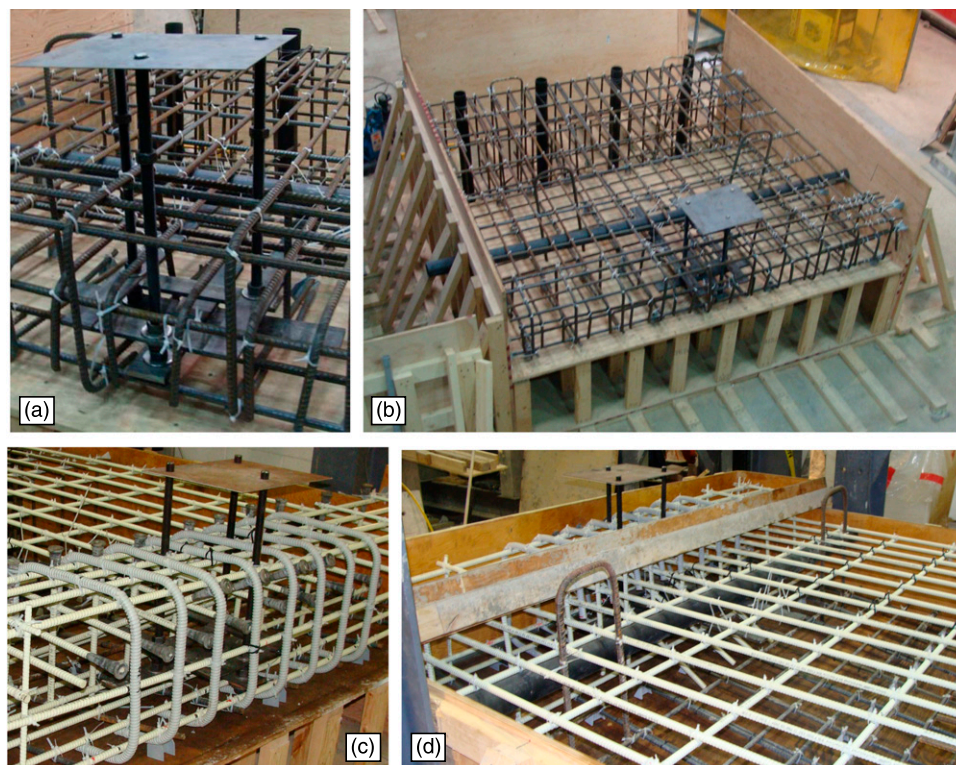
Views of bar arrangement and formwork: (a) and (b) steel-reinforced specimens; (c) and (d) GFRP-reinforced specimens (images by Khaled Sennah, Navid Nikravan, and Jacob Louie)
